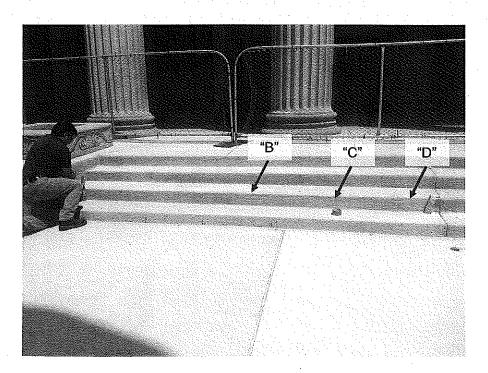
OVERALL PHOTO AT STAIRWAY A, NORTH SECTION
